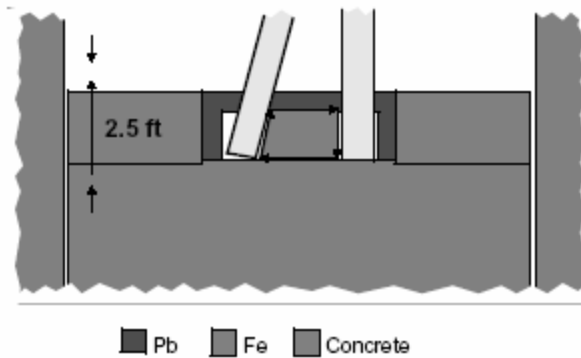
Horizontal Section of the Front Face of the Beam Dump at Beam Line Elevation
